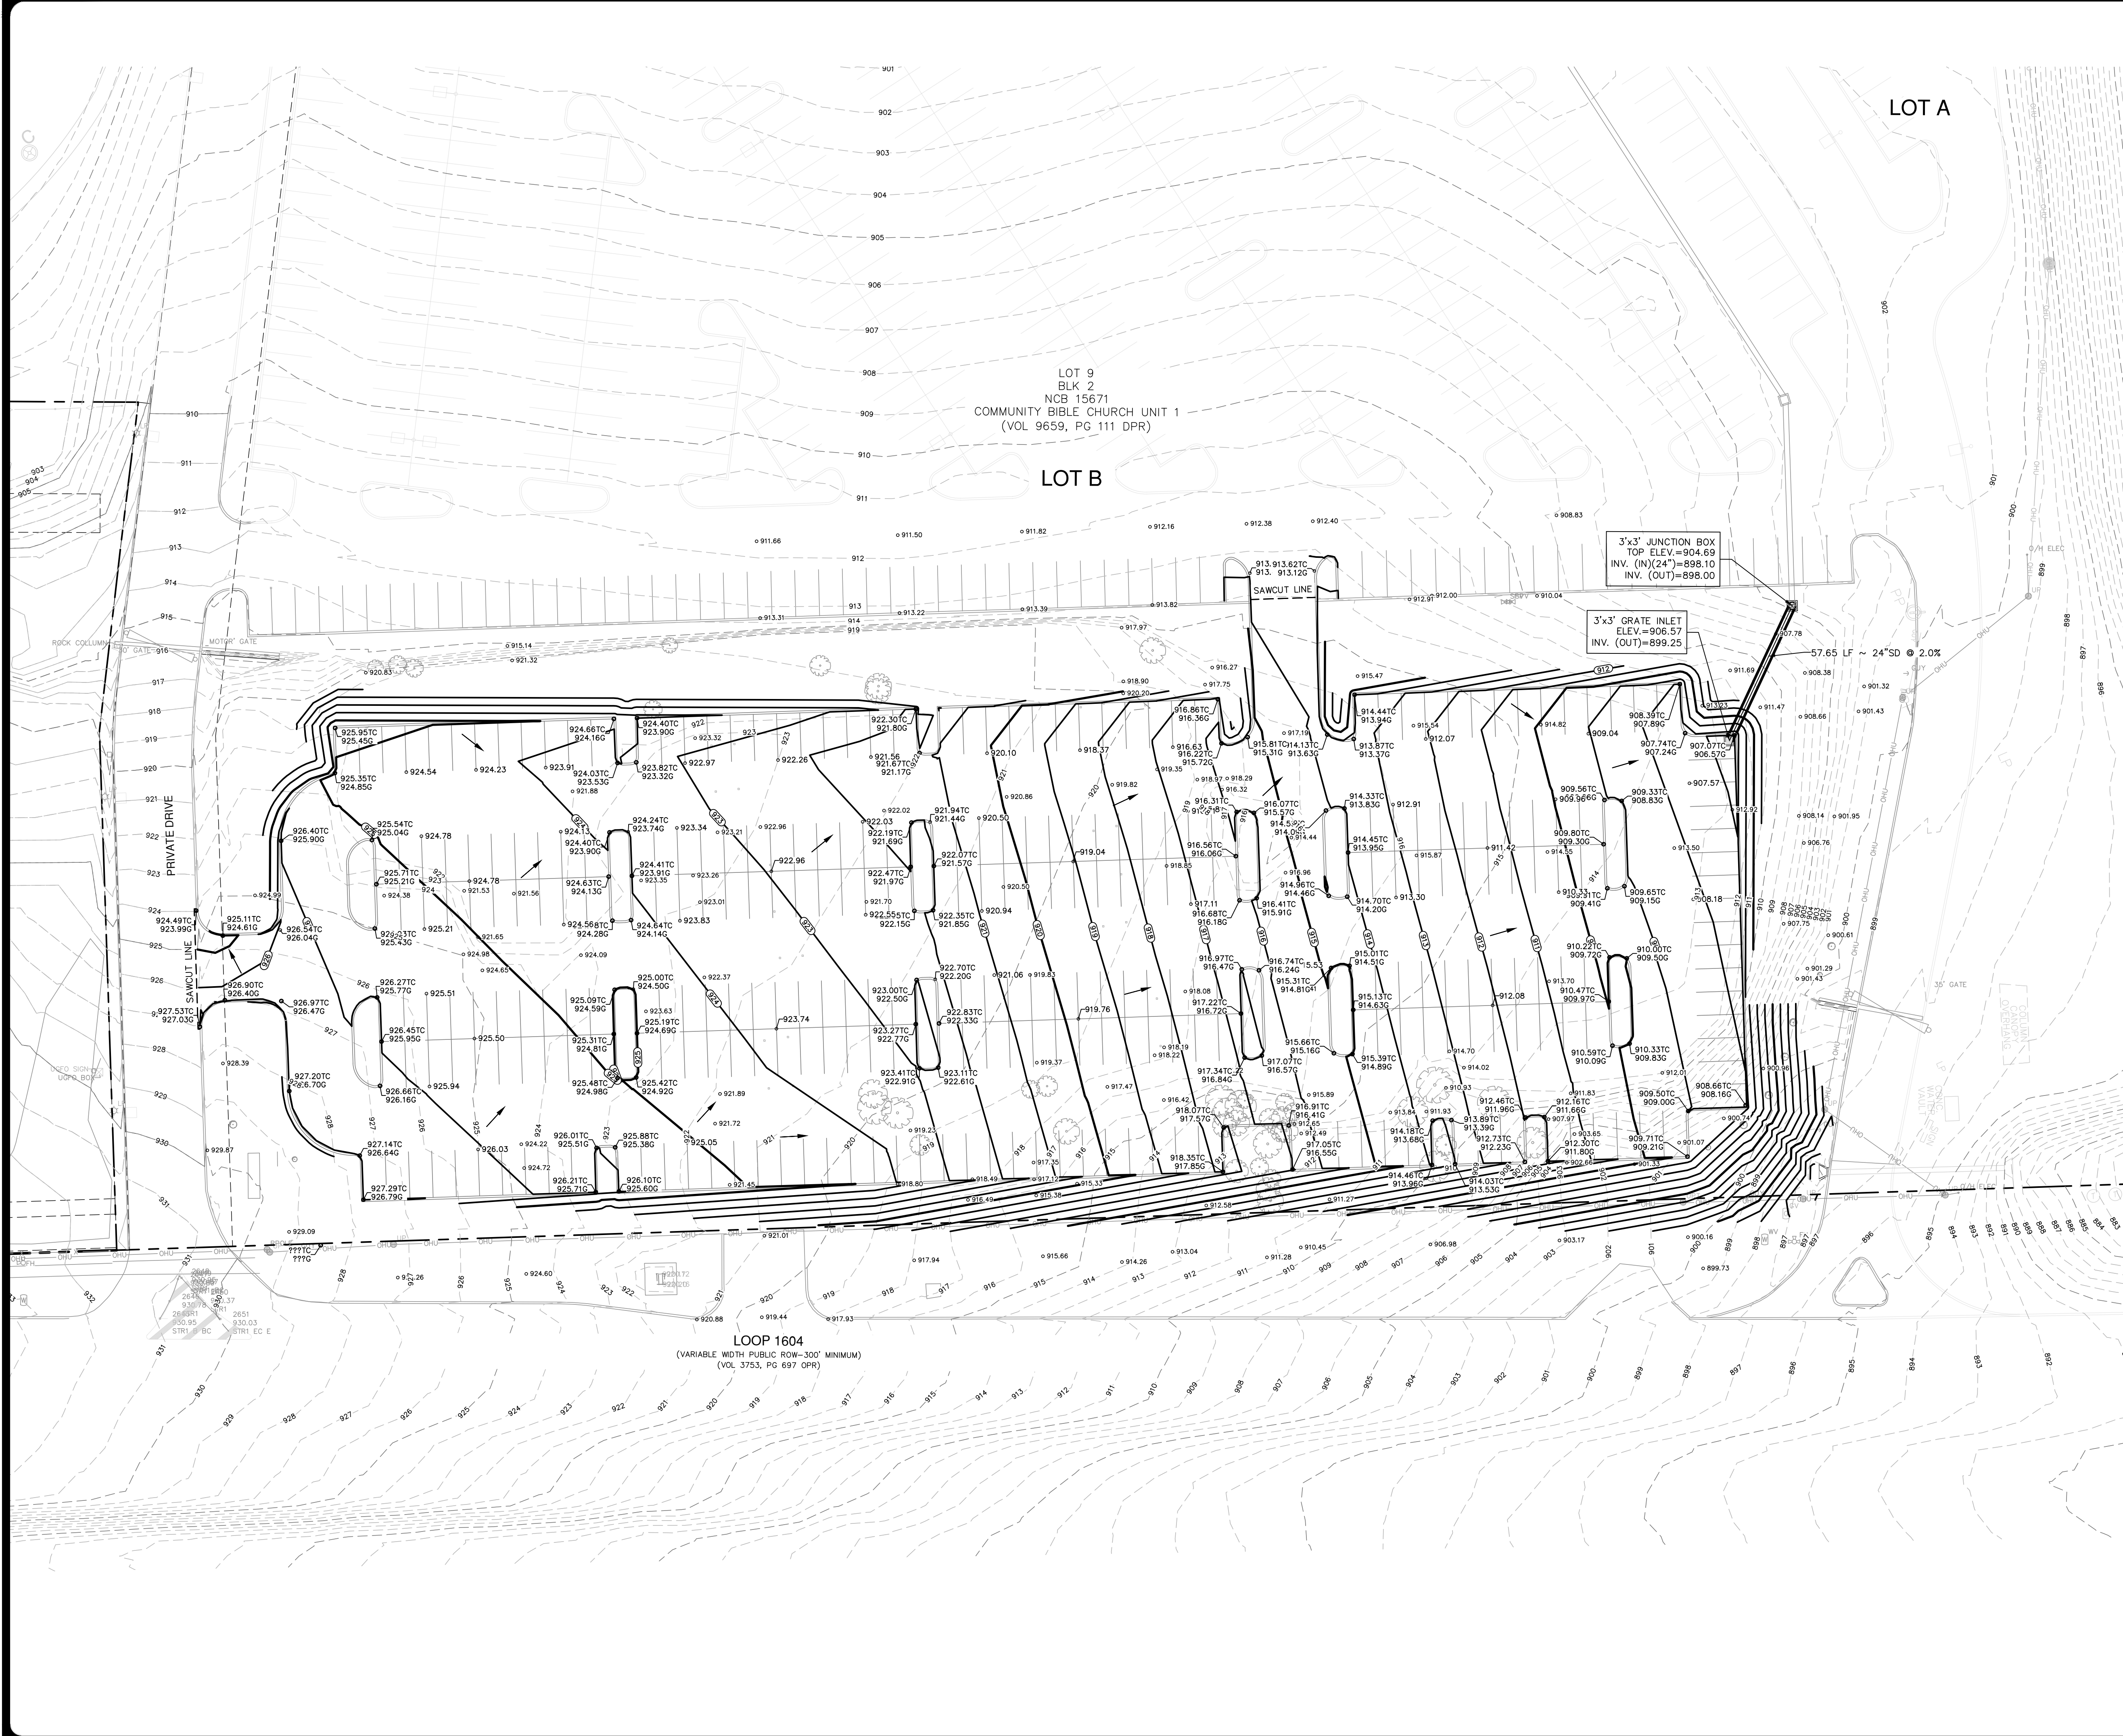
DETAILED GRADING AND DRAINAGE PLAN - LOT F
